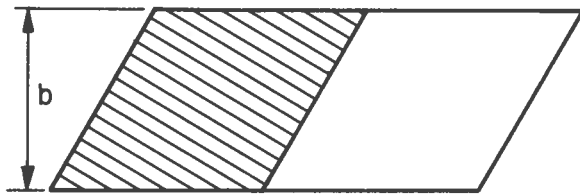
PLAN VIEW OF CONTINUOUS SLAB
